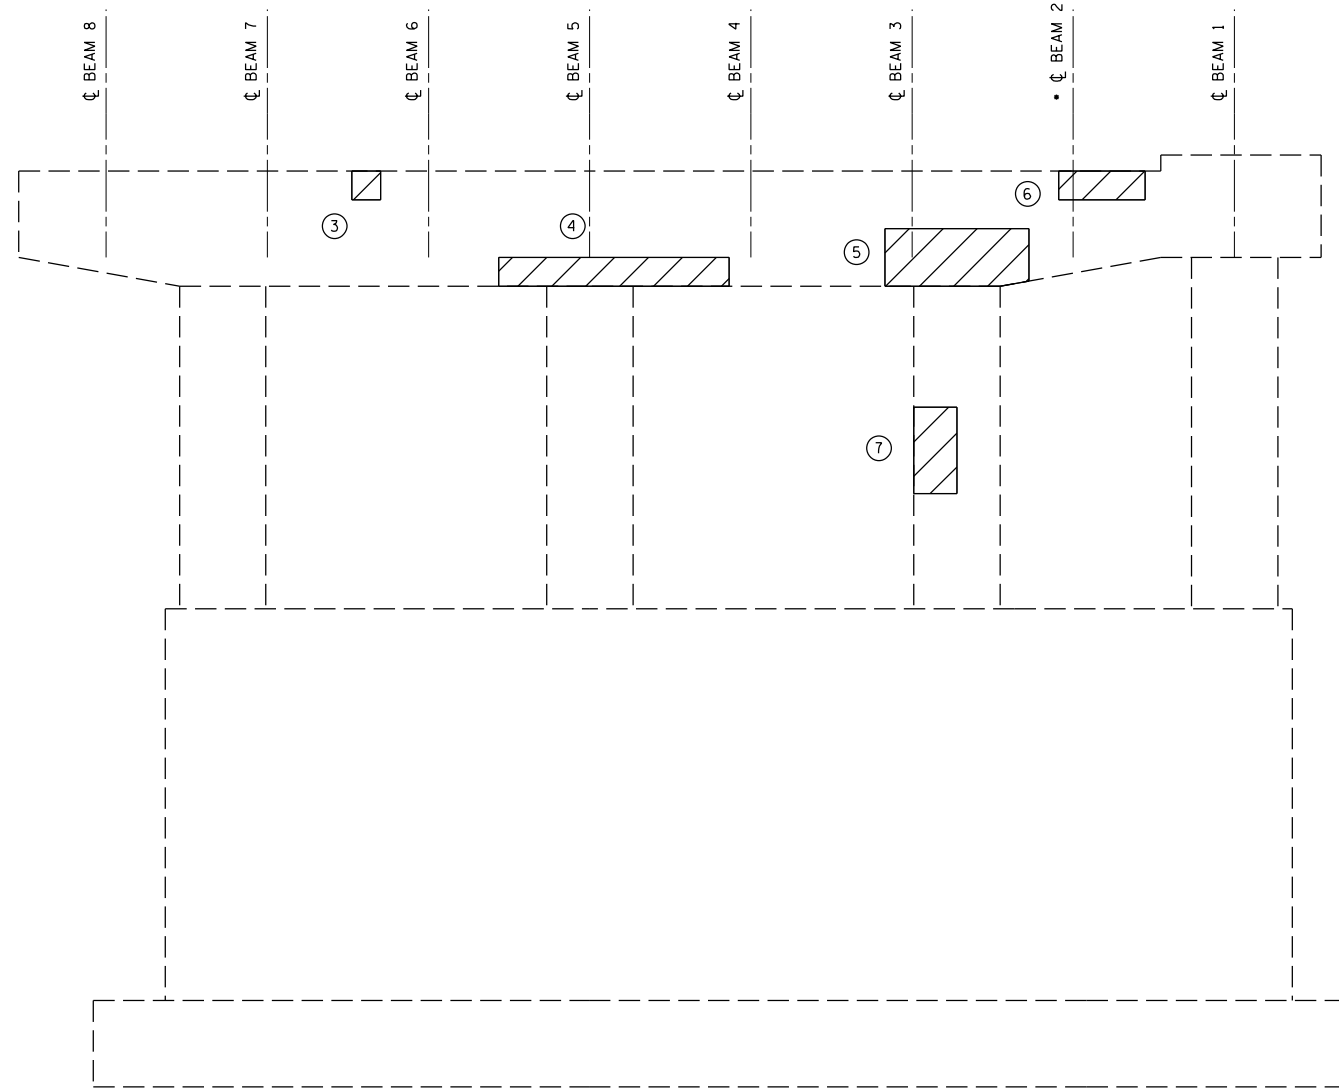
DETAIL OF STRUCTURAL CONCRETE REPAIR AT ABUTMENTS
